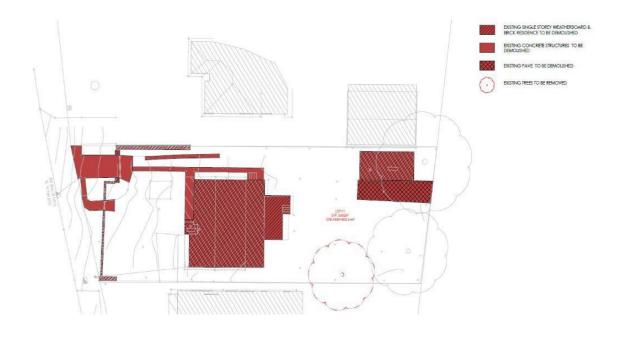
Demolition Plan of Site at Lot 11 of DP 263267
